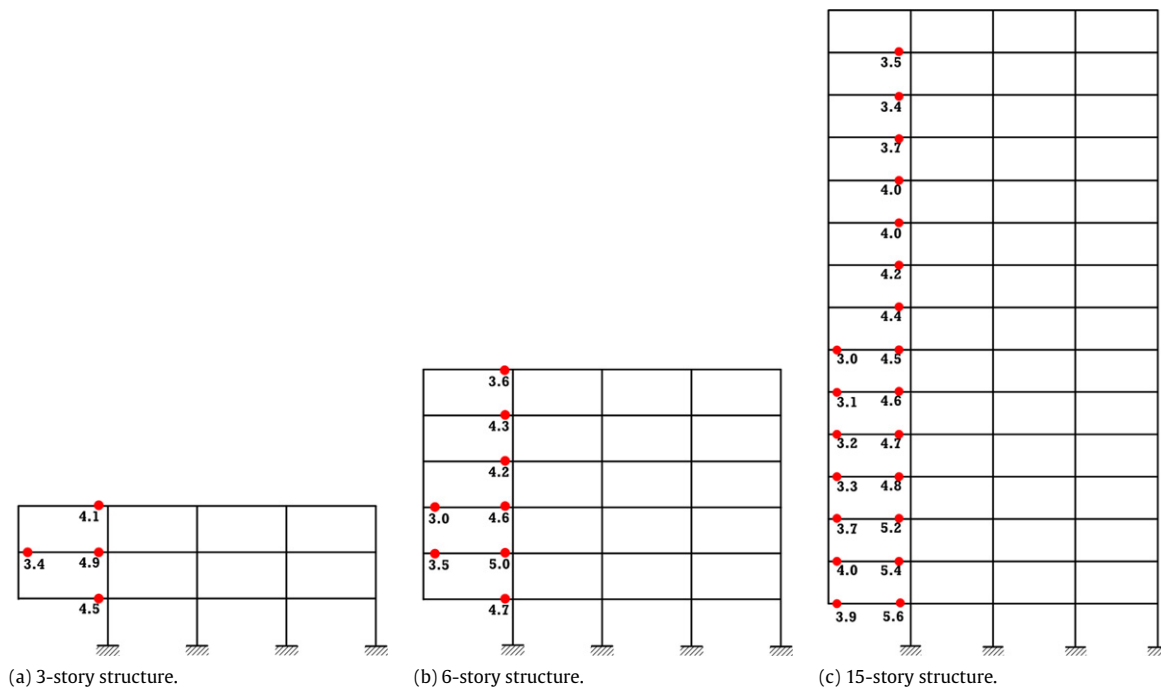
Locations of hinges when the first-story corner column of the GLRS structures was removed (GSA 2003).
